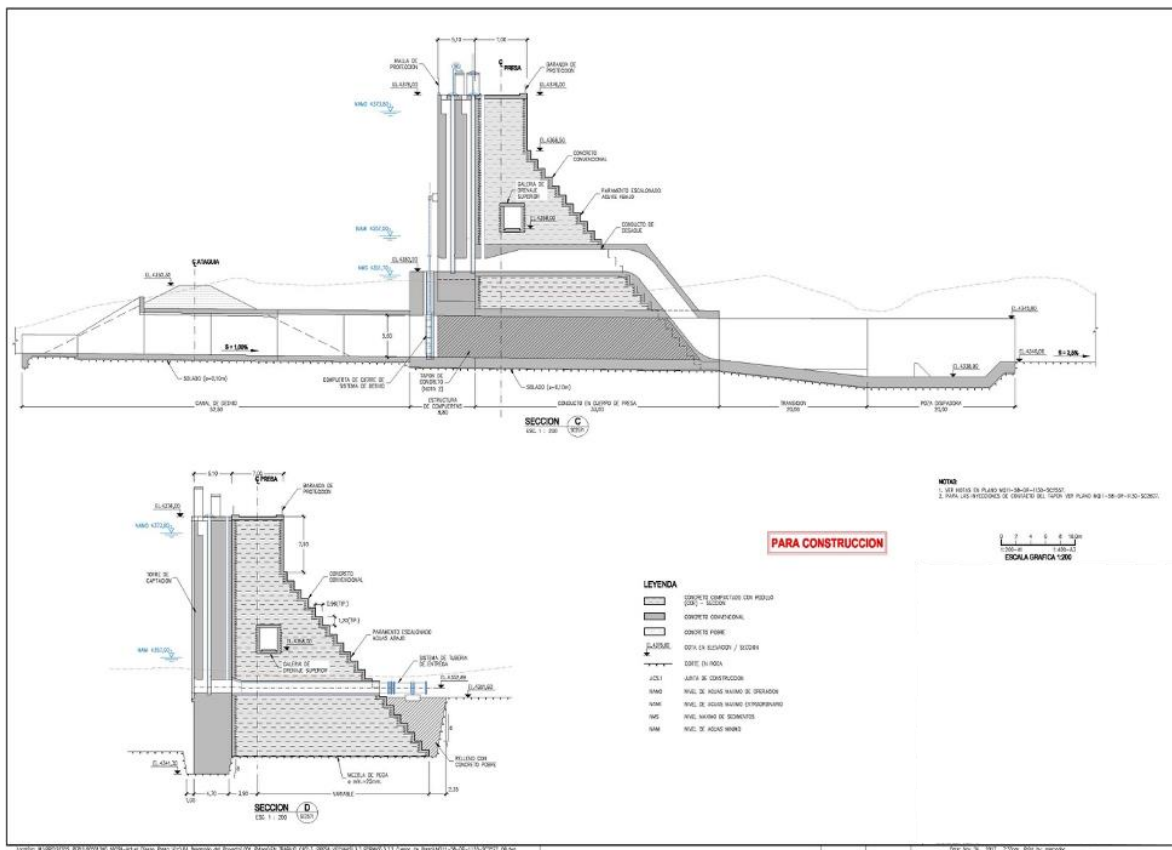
Vizcachas Dam lo- level outlet and stepped spillway
